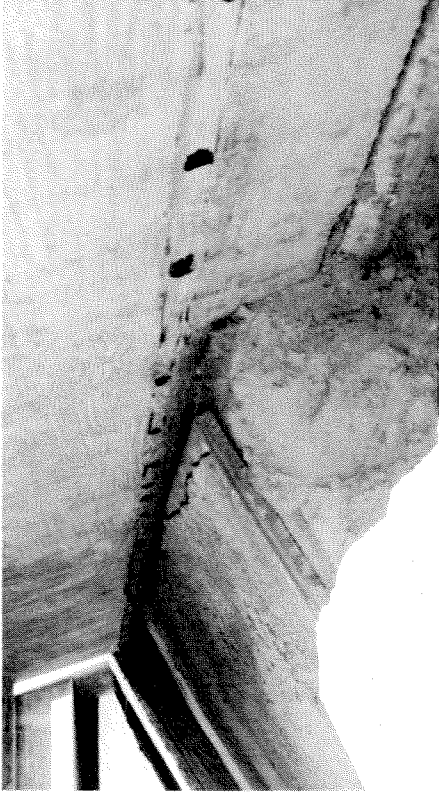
50 Movement of concrete apron, Yarnell Street undercrossing, Foothill freeway.
